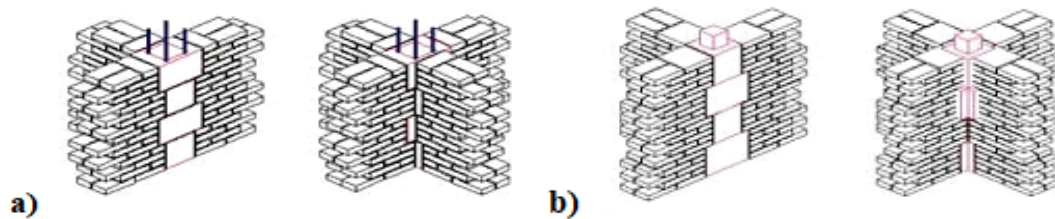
a) Fabricated column with vertical reinforcement at wall junction, b) fabricated column with core reinforcement at wall junction [56].
